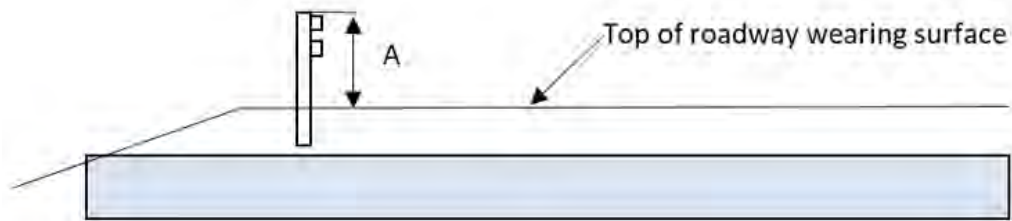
Partial cross-section view of buried structure with rail mounted in fill
